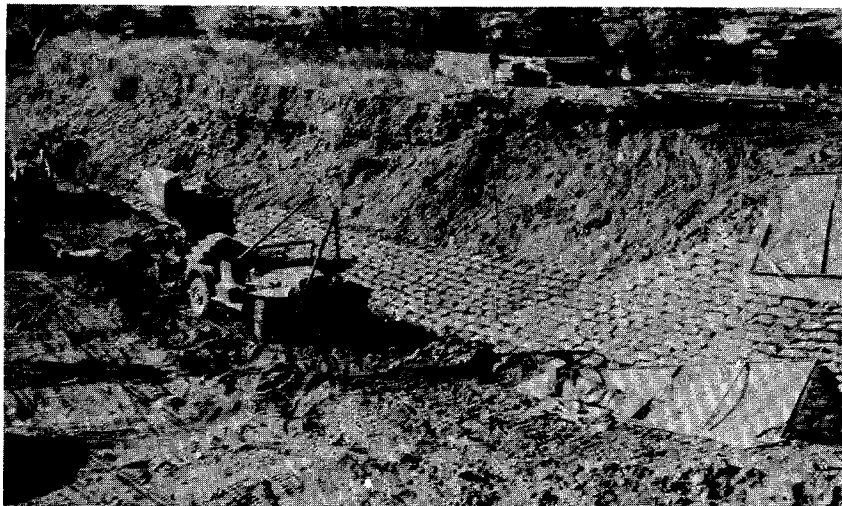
Installation of sacked concrete riprap on upstream leftbank side of bridge in 1956. (From Nevada Dept. of Highways.)
